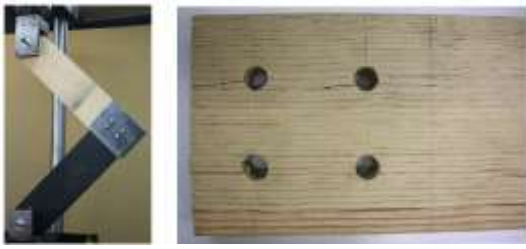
Test object and test setup and pattern crack test object (Dourado et al., 2018)
